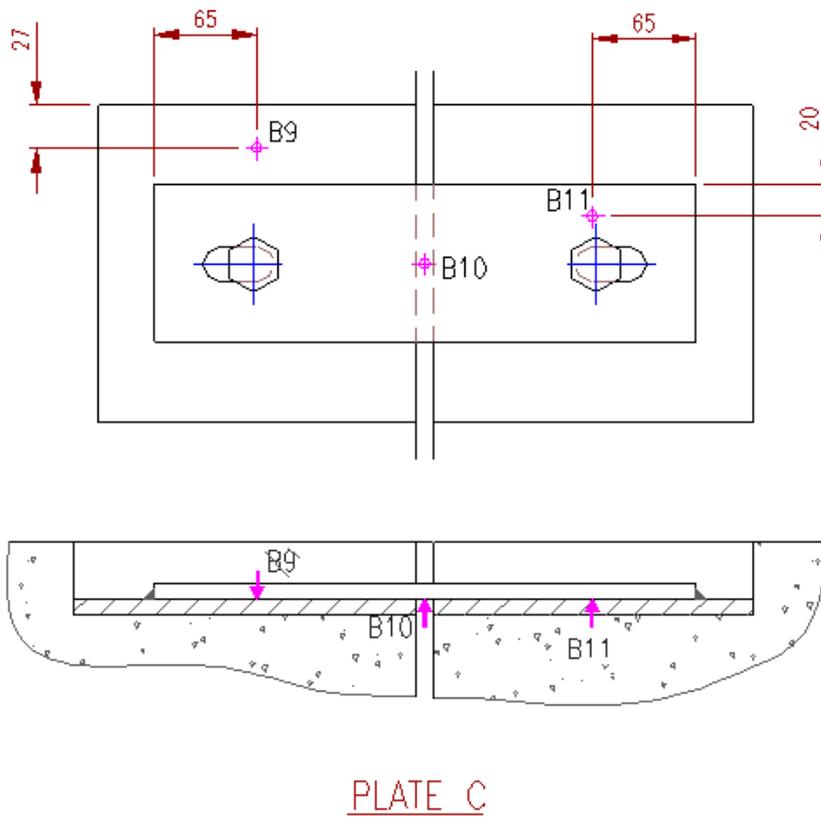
Butt-joint of slab construction detail as tested in WFRA 40938
